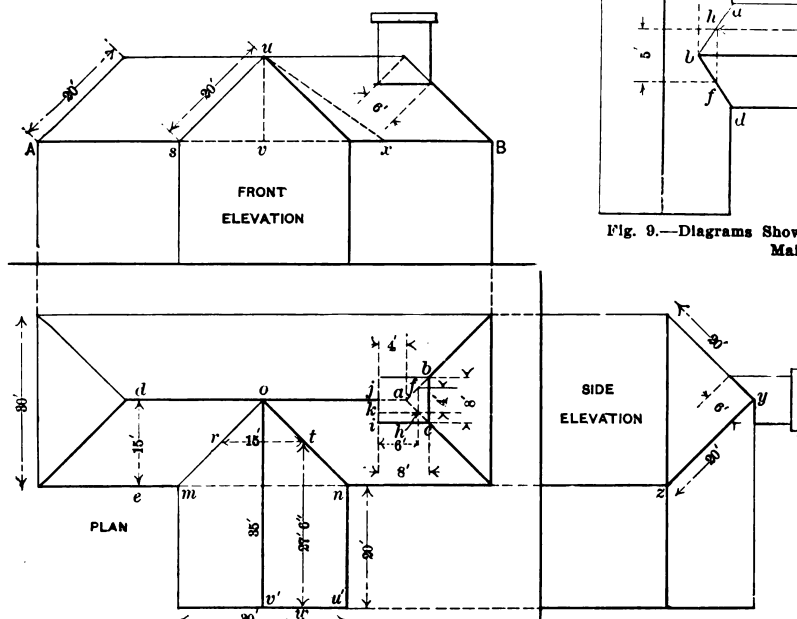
Plan and Elevations of Hip Roof with Wing Attached.
